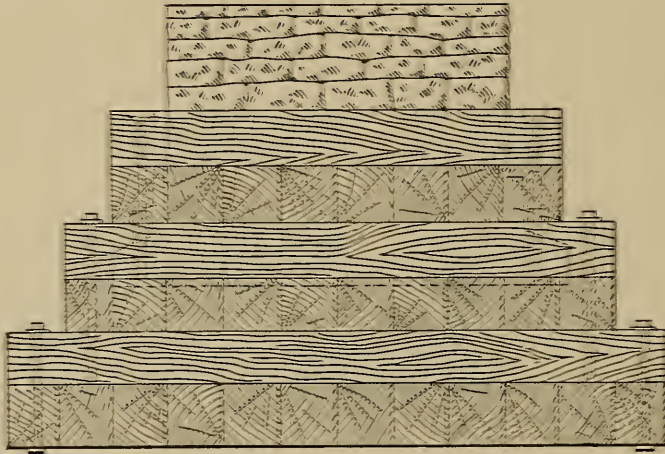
Longitudinal Section of Steam Hammer Foundation.
